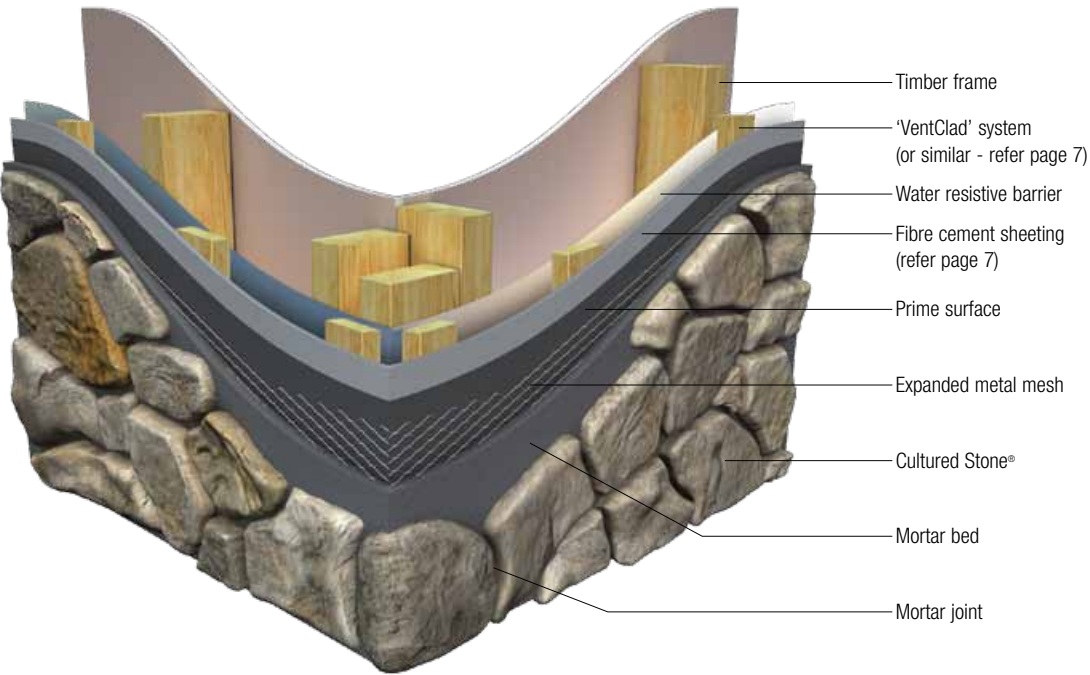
Timber Frame - Fibre Cement Clad Typical Construction (Dwg # CS-01.01)
